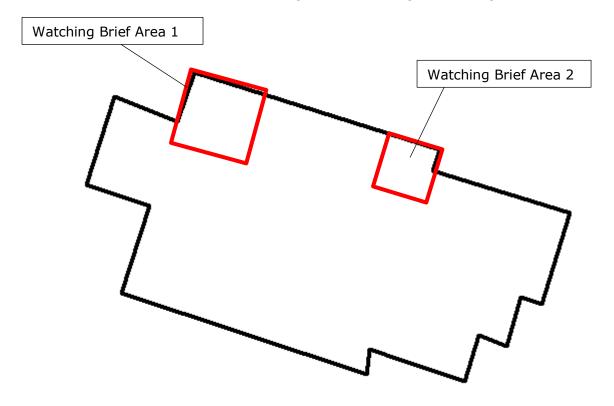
Location of watching brief areas shown on a basic floor plan church of the building (north to top)
